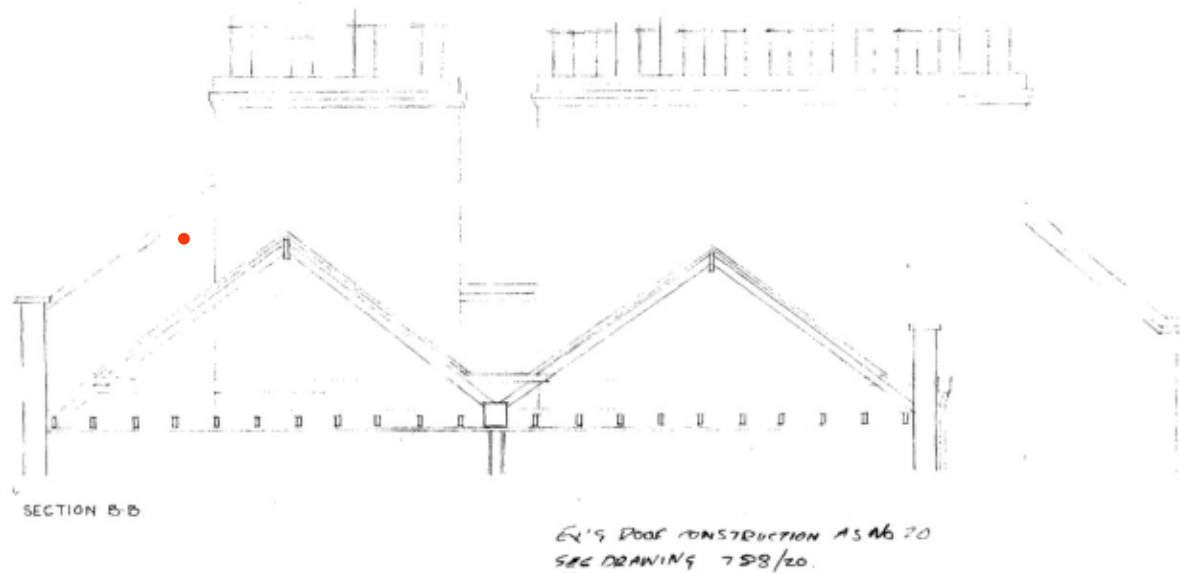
Section from a planning permission sought for No.21 and 20 in which the roof of No.22 can be just deciphered behind the chimneys which mark the boundary between the houses. (Source: Camden Planning Applications)
